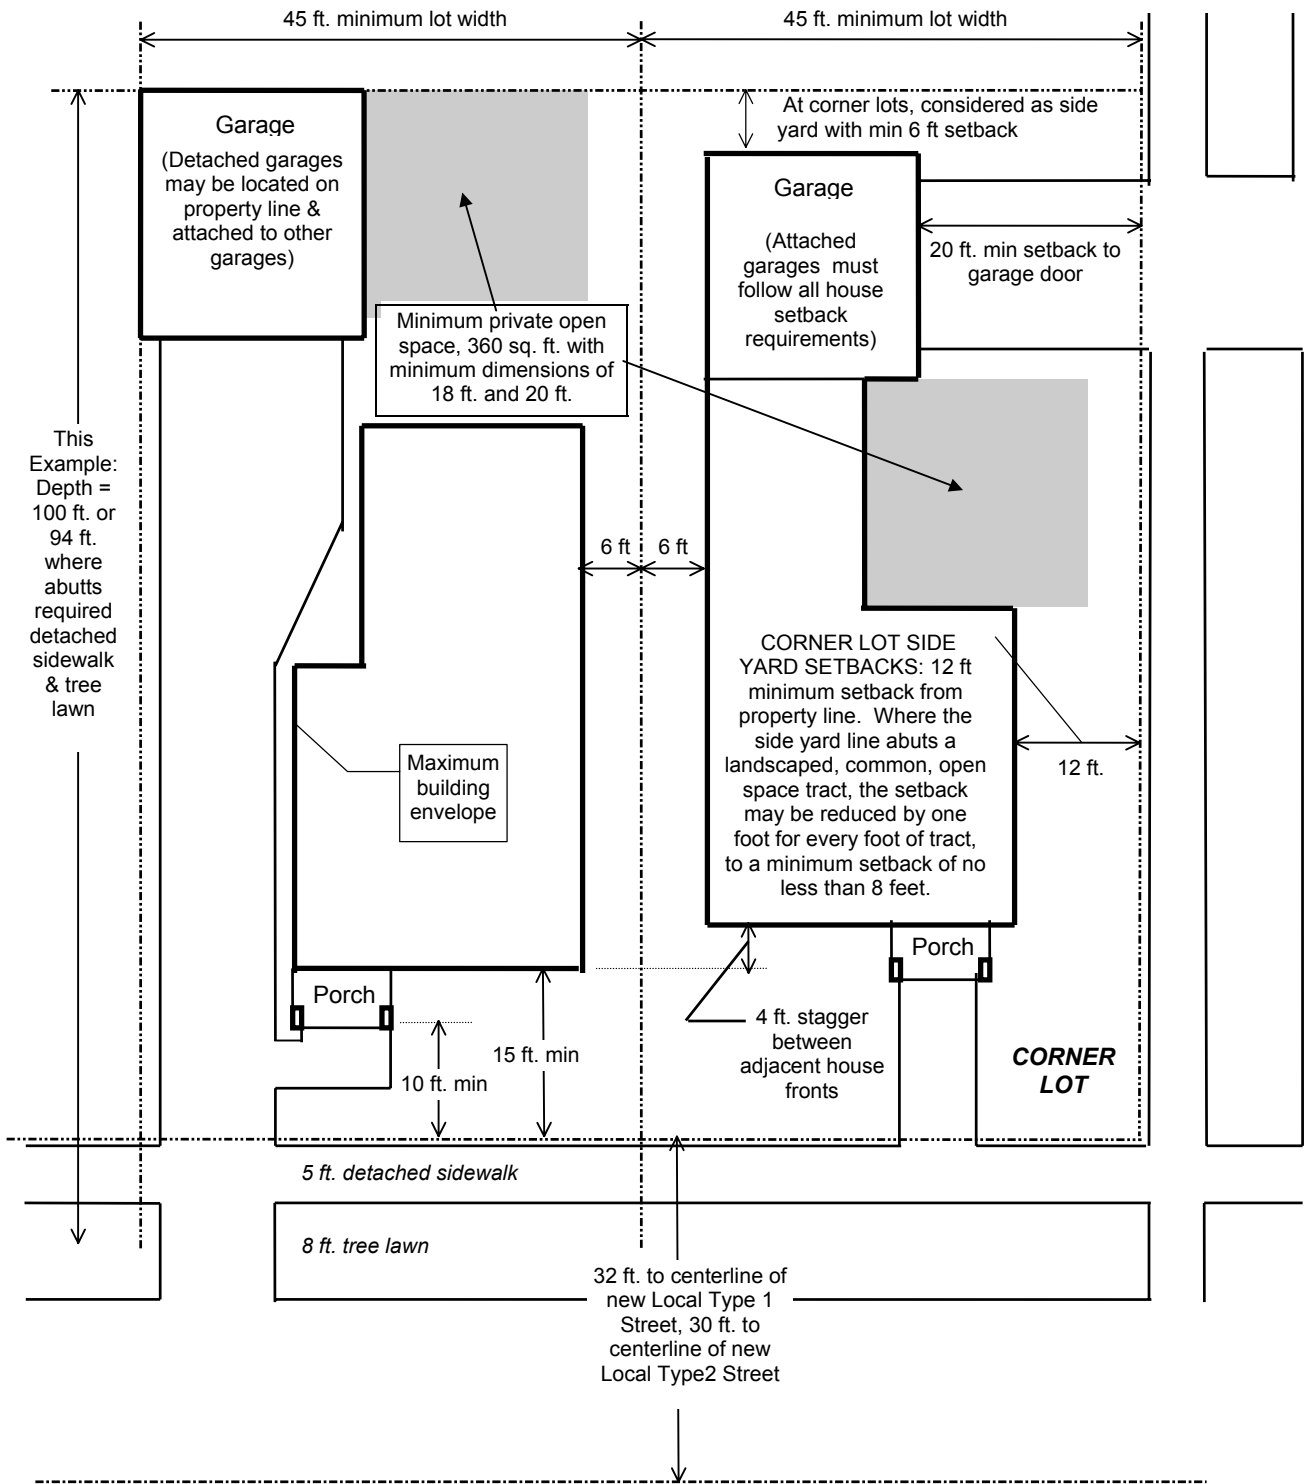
Dimensional Standards for Small Lots with Alley Loaded Garages in Rear Yards
